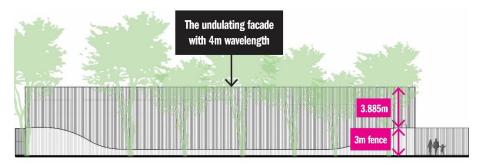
Chatswood Dive - Frank Channon Walk - Public interface elevation
